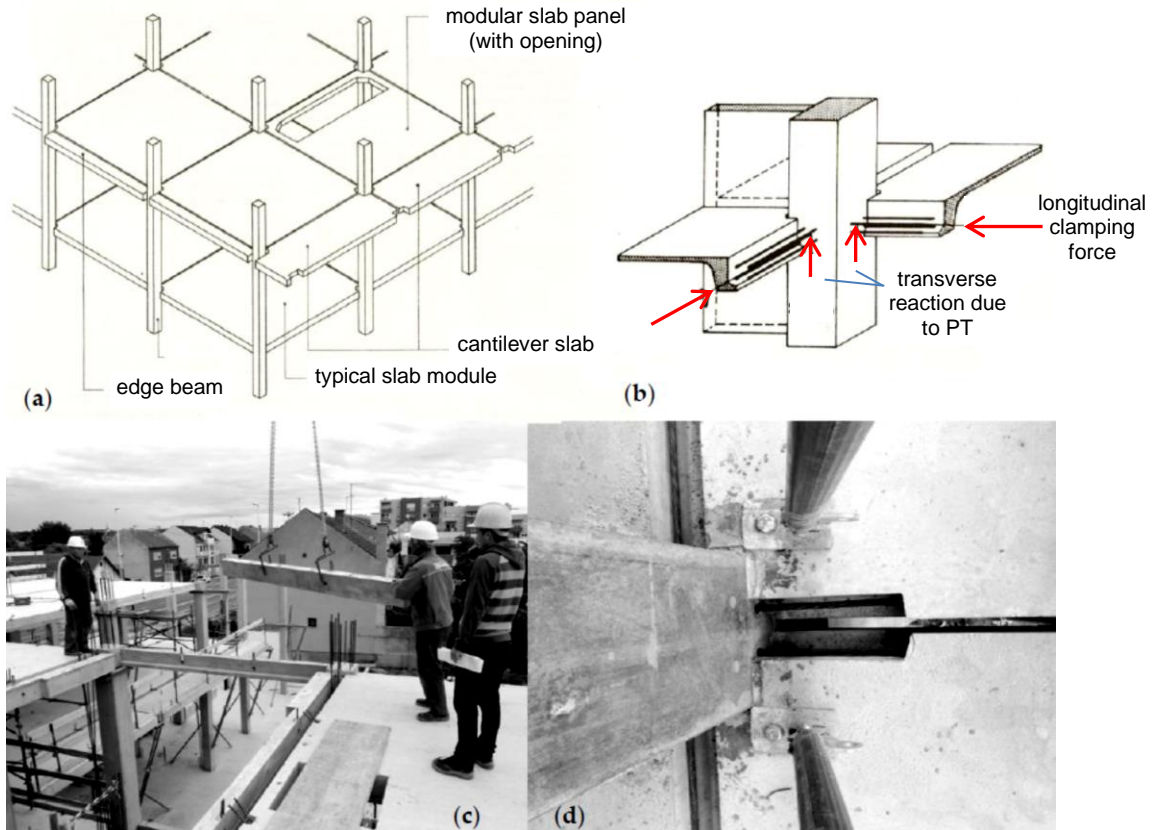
Modular precast building structure; (a) modular concept depicting roles of precast concrete slabs, beams, and columns; (b) clamping forces and transverse shear reaction forces generated at slab-column connections due to harped post-tensioned (PT) tendons employed in the system; (c) modular component installation; (d) grout pockets at PT slab-column connection regions (adapted from Nikolic 2018)
